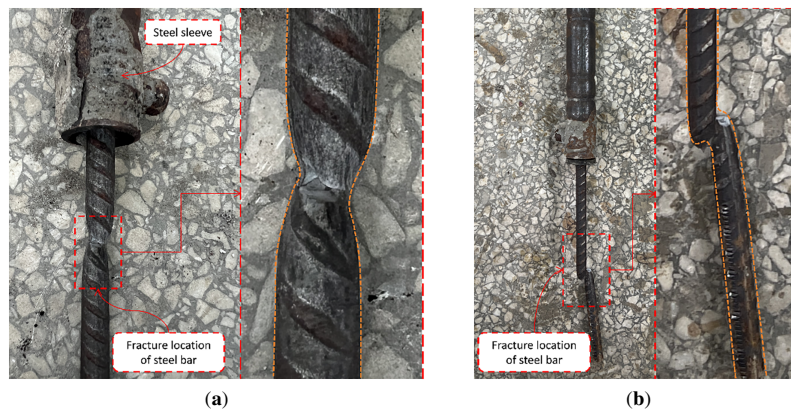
Tensile fracture of rebar. (a) Overall view of the fracture location outside the steel sleeve; (b) close-up view detailing the necking phenomenon at the fracture point.
